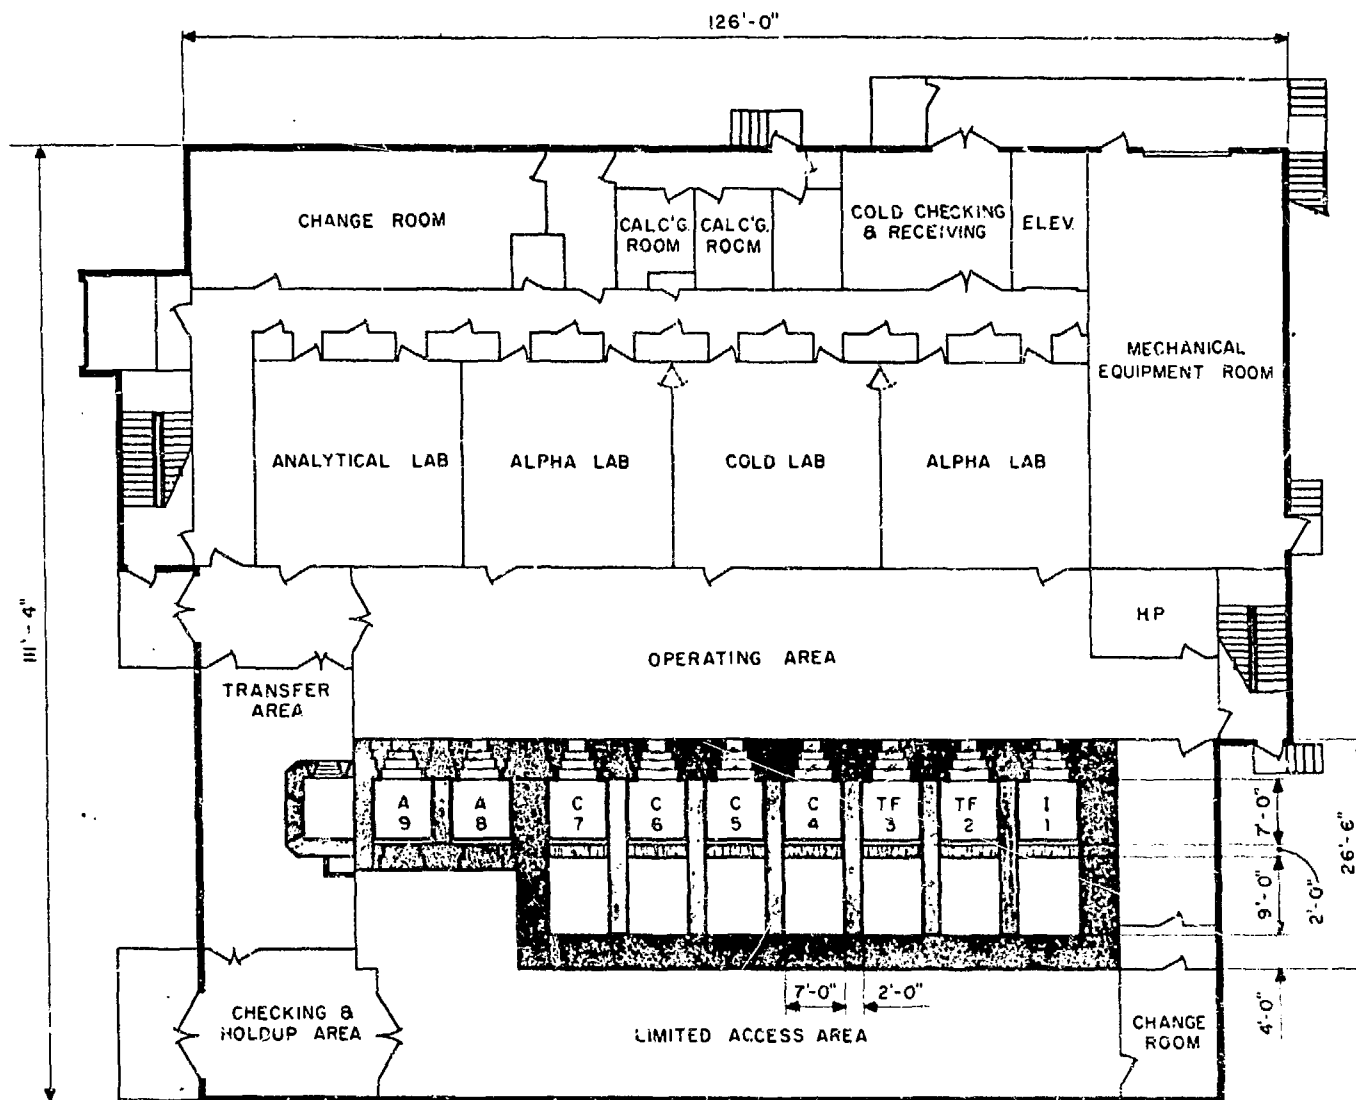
First-Floor Plan, Transuranium Processing Plant.
